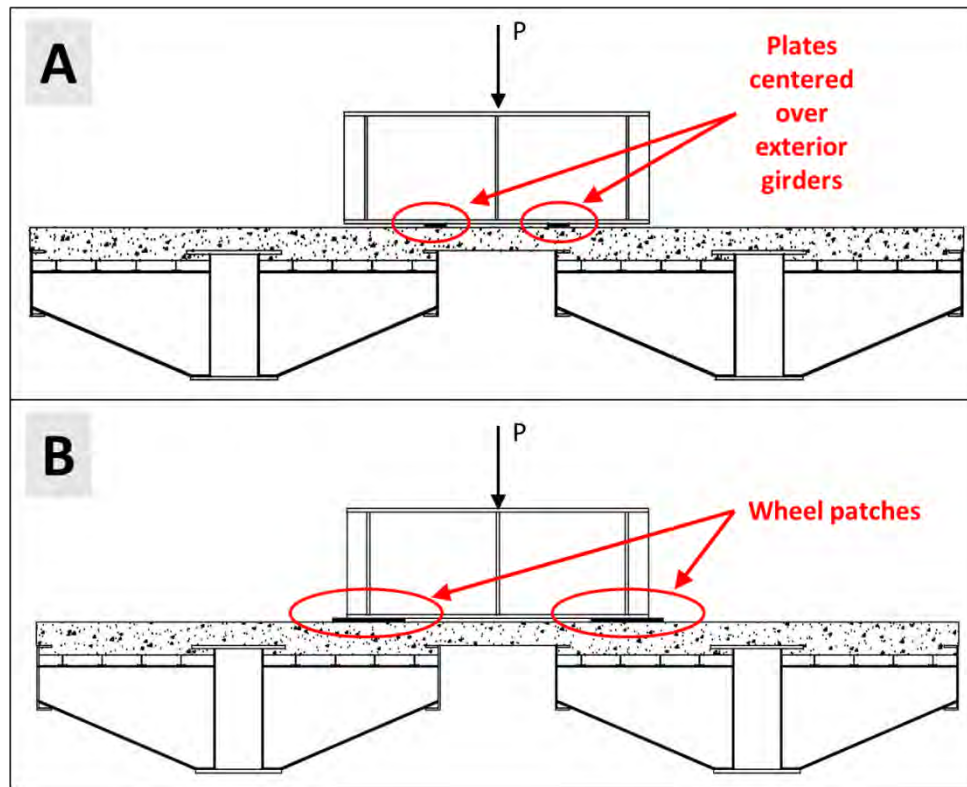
Test 9 (A) & Test 10 (B) load set-up at Section E (looking south)
